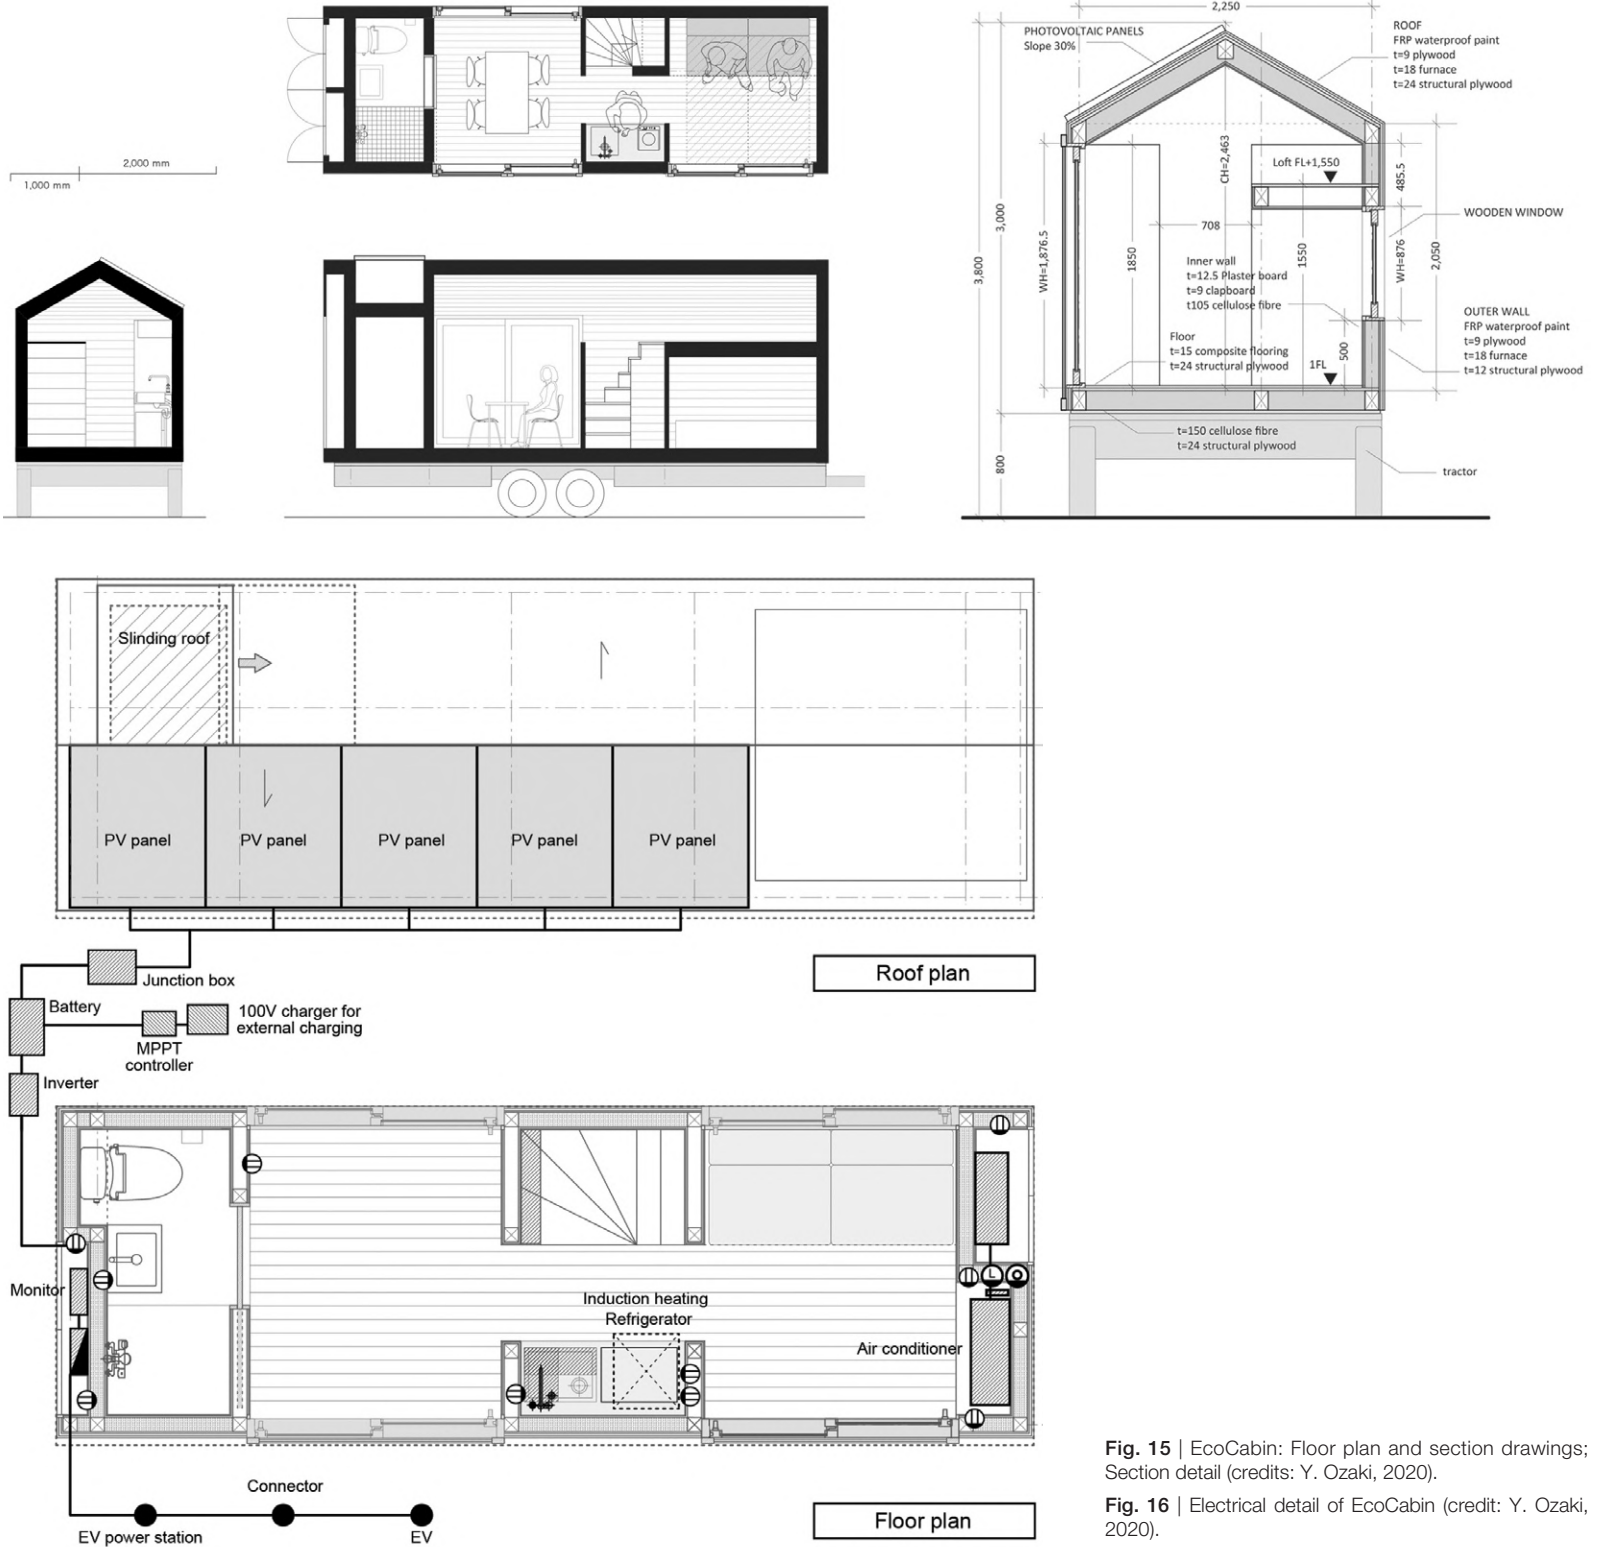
| EcoCabin: Floor plan and section drawings; Section detail (credits: Y. Ozaki, 2020).
